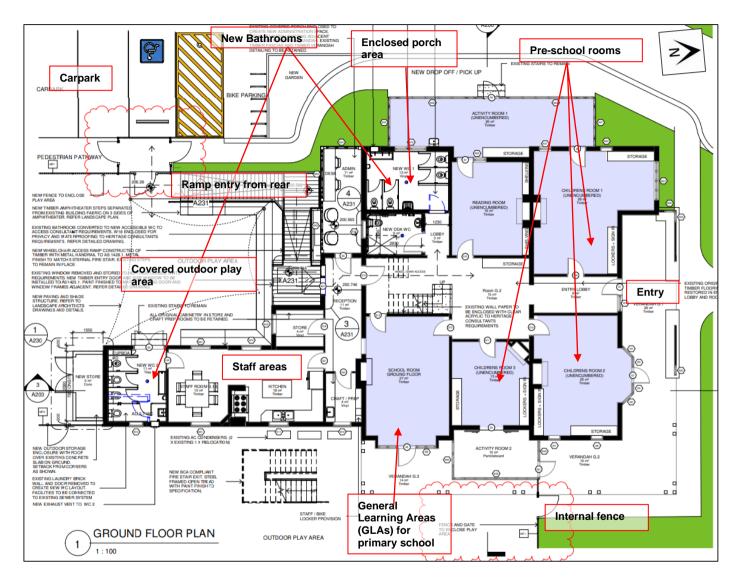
| Proposed Ground Floor Plan (Source: Applicant's SRTS 2020)
